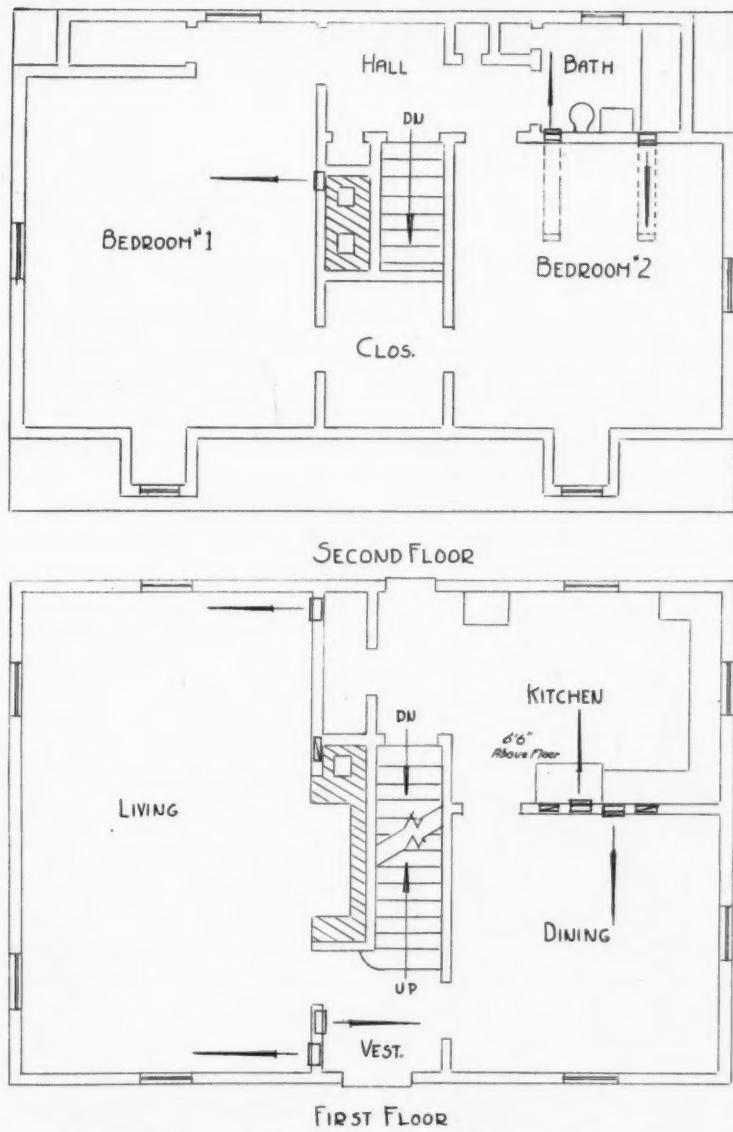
First and Second floor plans prepared to show location of registers so that the basement piping sketch can be prepared.
